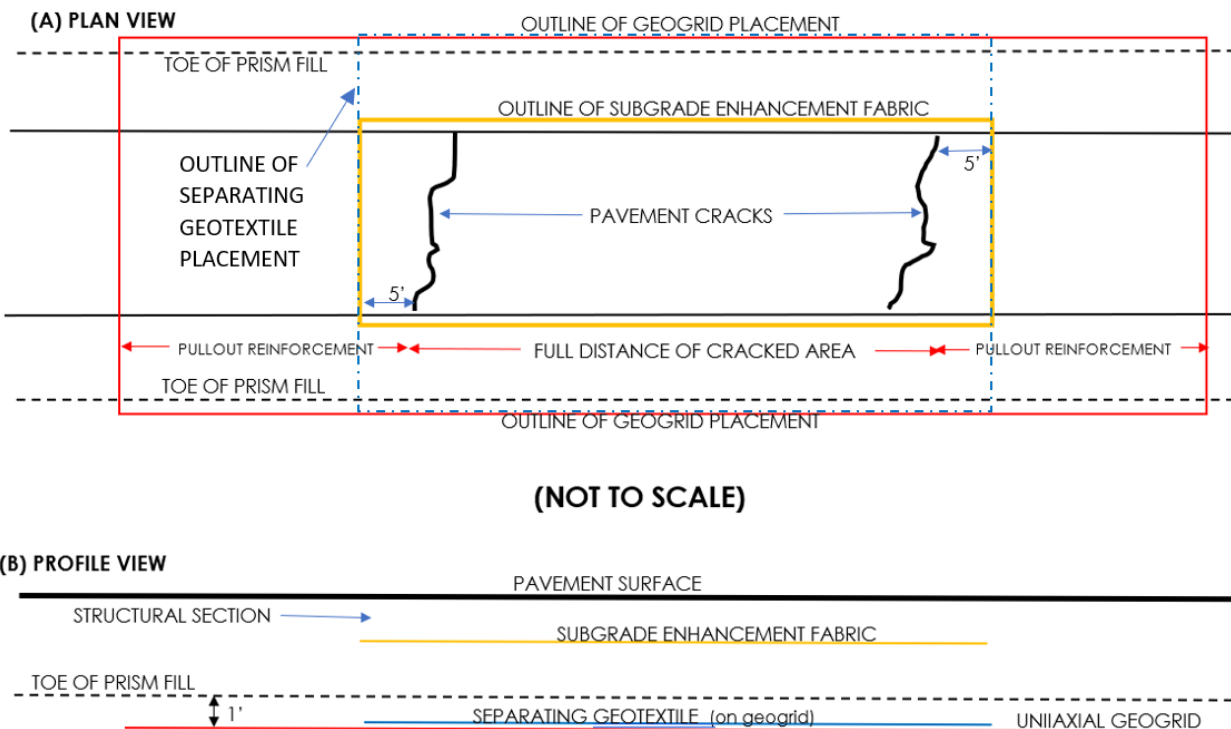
(A) Plan View (top) and (B) Profile View (bottom) of subsidence/cracking long-term mitigation design. The plan view outline of the geogrid placement is shown in red. The plan view outline of the separating fabric is shown with a blue dashed line. The plan view outline of the subgrade enhancement fabric is shown in orange. See text for more details.
